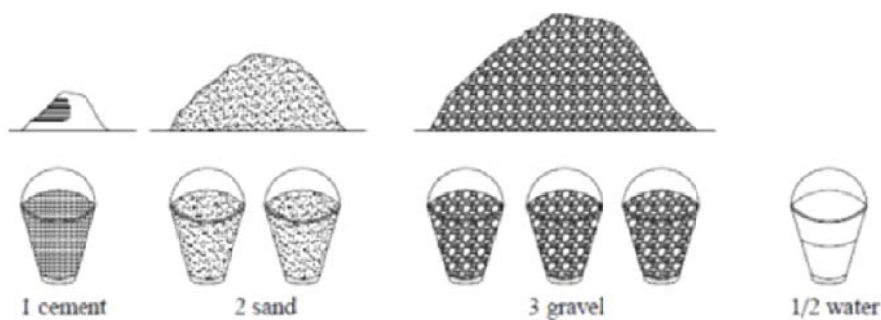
Simple measurement of concrete mix "1 cement : 2 sand : 3 gravel"
